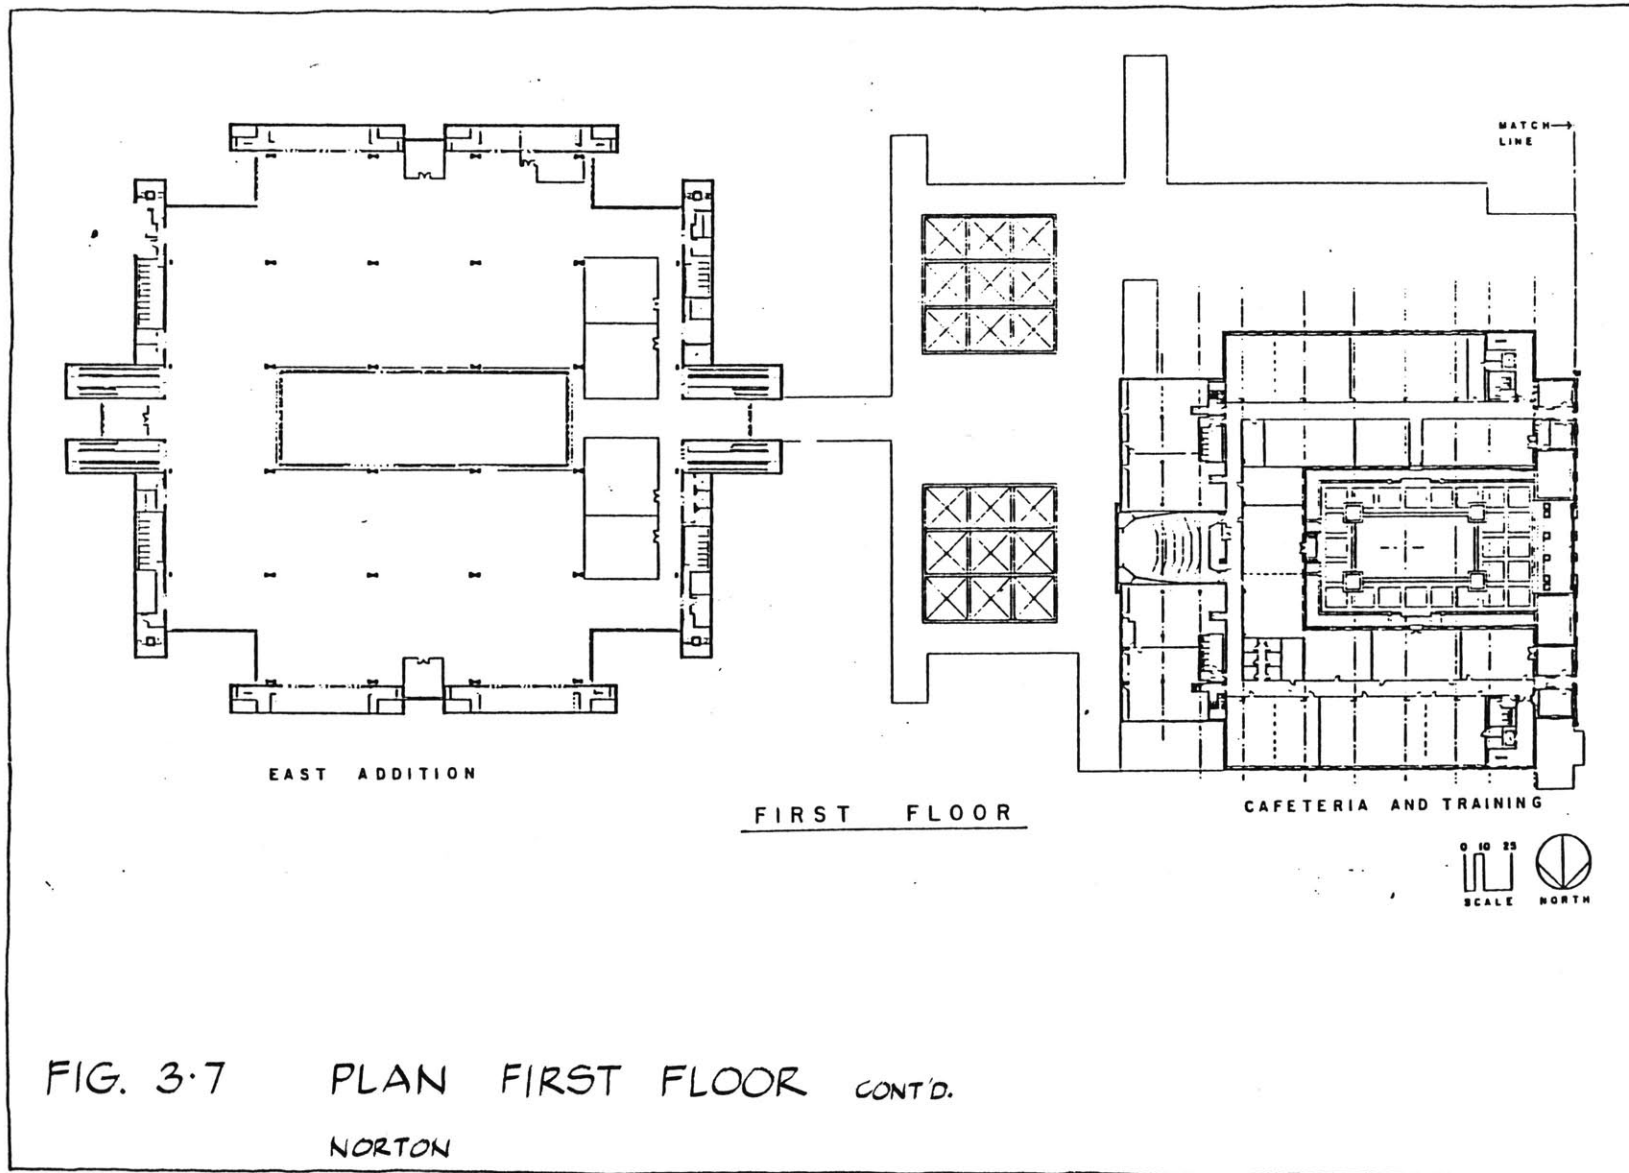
PLAN FIRST FLOOR CONT'D.
